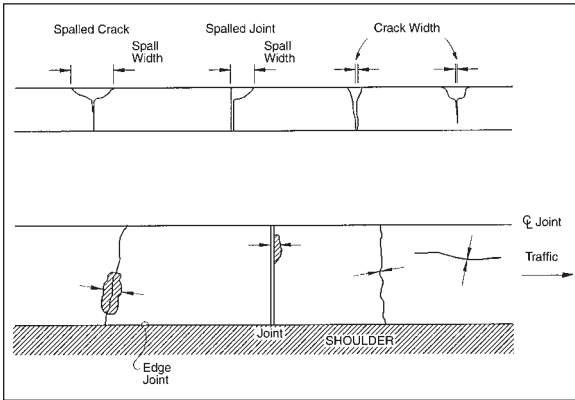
Measuring Widths of Spalls and Cracks in Jointed Concrete Pavement
